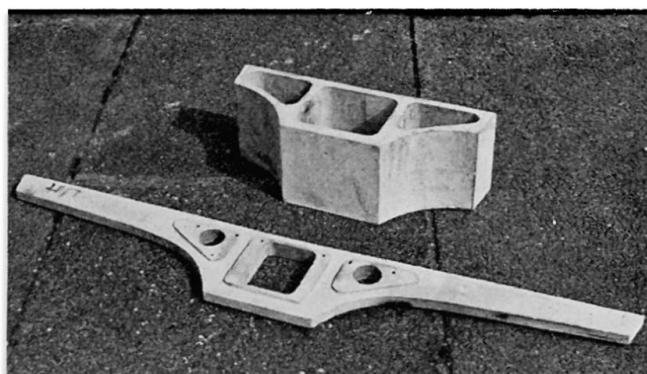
Hammersmith Flyover — Basic units used in construction of model.
